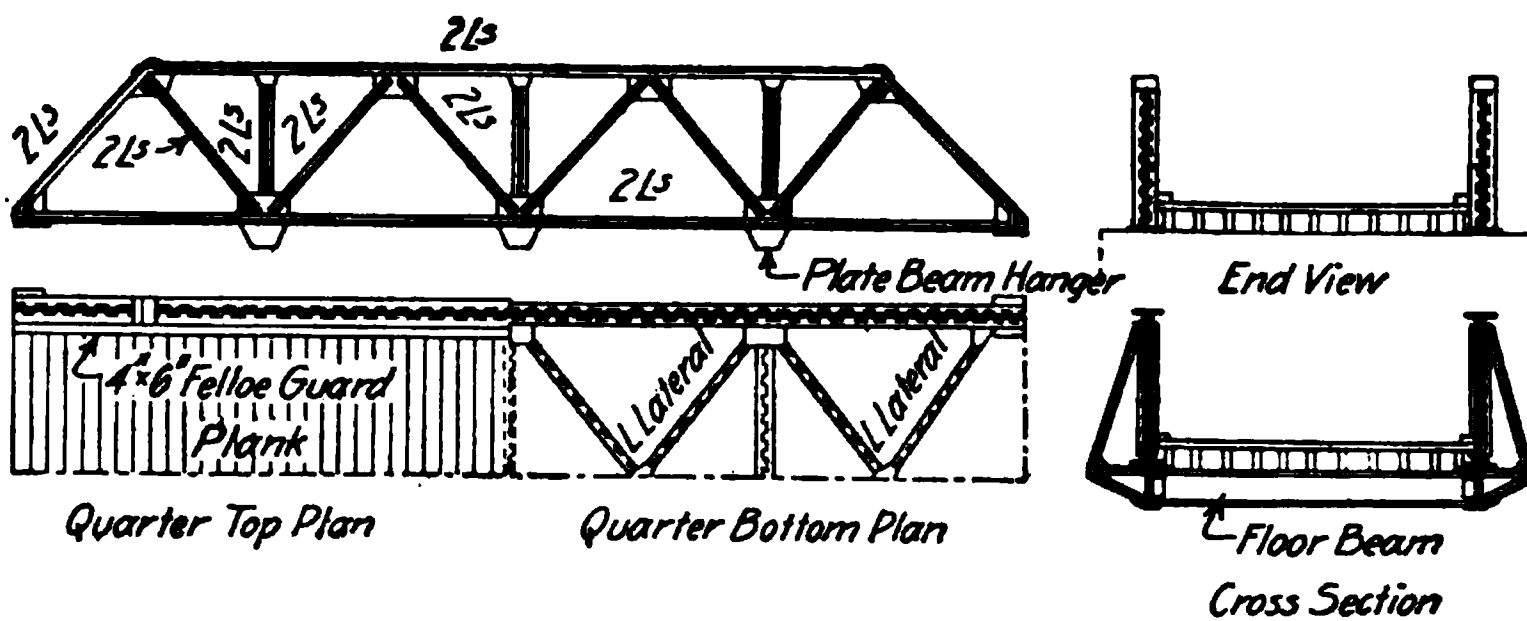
PLAN OF A LOW OR "PONY" TRUSS HIGHWAY BRIDGE.
